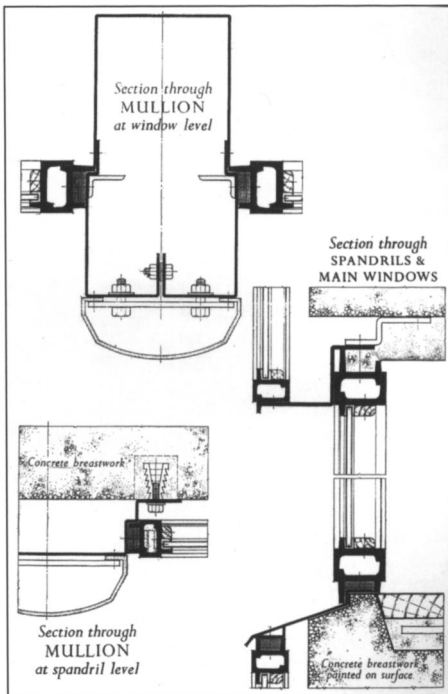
Peter Jones: plan section of mullions at both window and backing wall level, together with vertical section (from Henry Hope and Sons Ltd., *Hope's Window Walls*, 1956).
